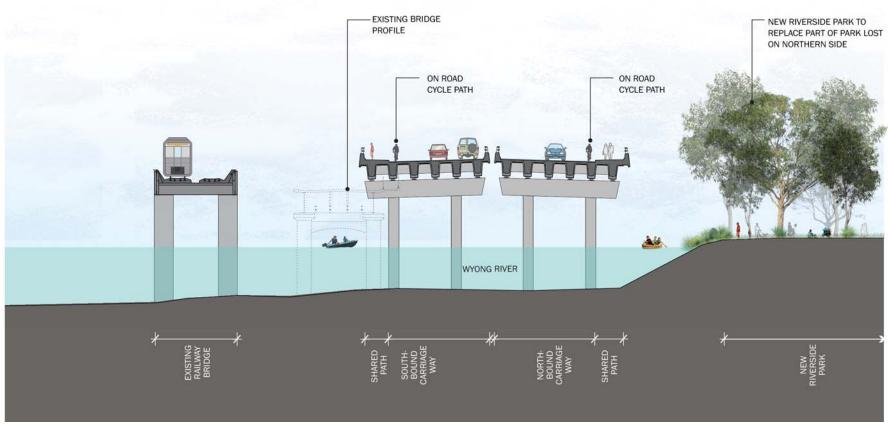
Proposed road cross section A at Ch.460 (Scale 1:400 @ A3)
